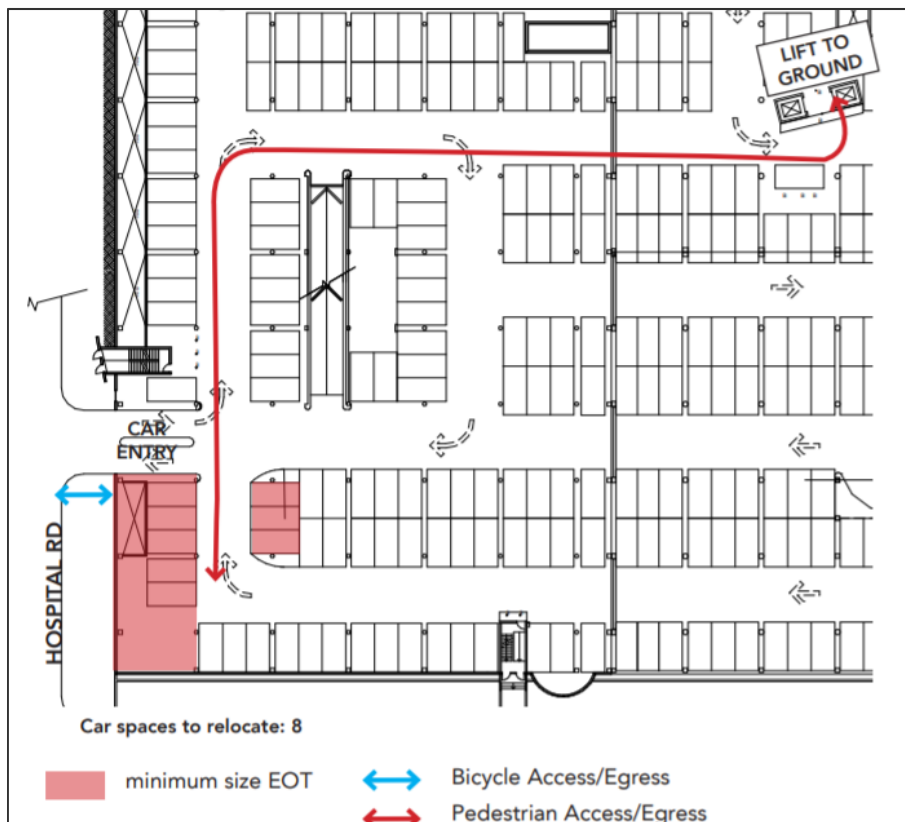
| Proposed bicycle parking and end-of-trip facility location within existing carpark
